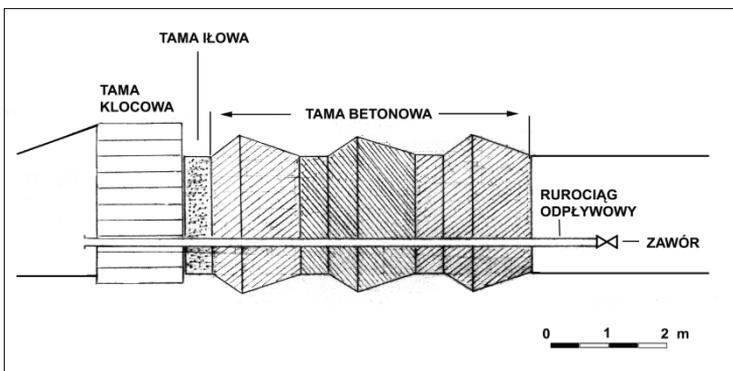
Structure section of the block-loam-concrete water dam in the Gussmann longitudinal (Level V).
